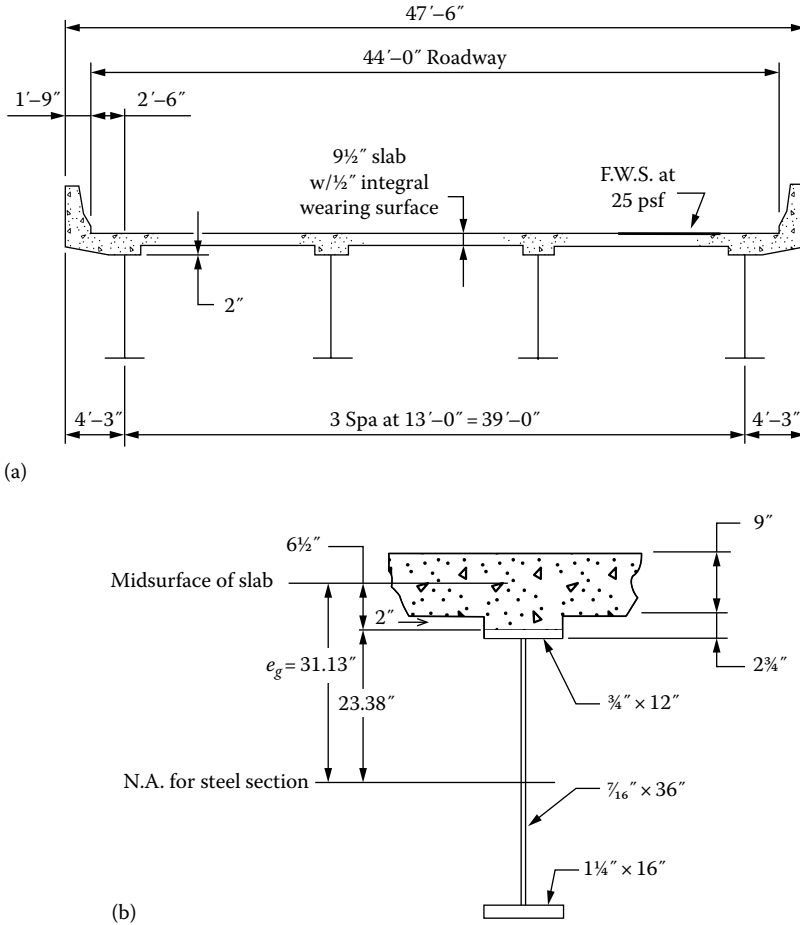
(a) Bridge cross section for Example 4.2. (b) Girder cross section for Example 4.2. (Courtesy of AISI.)
